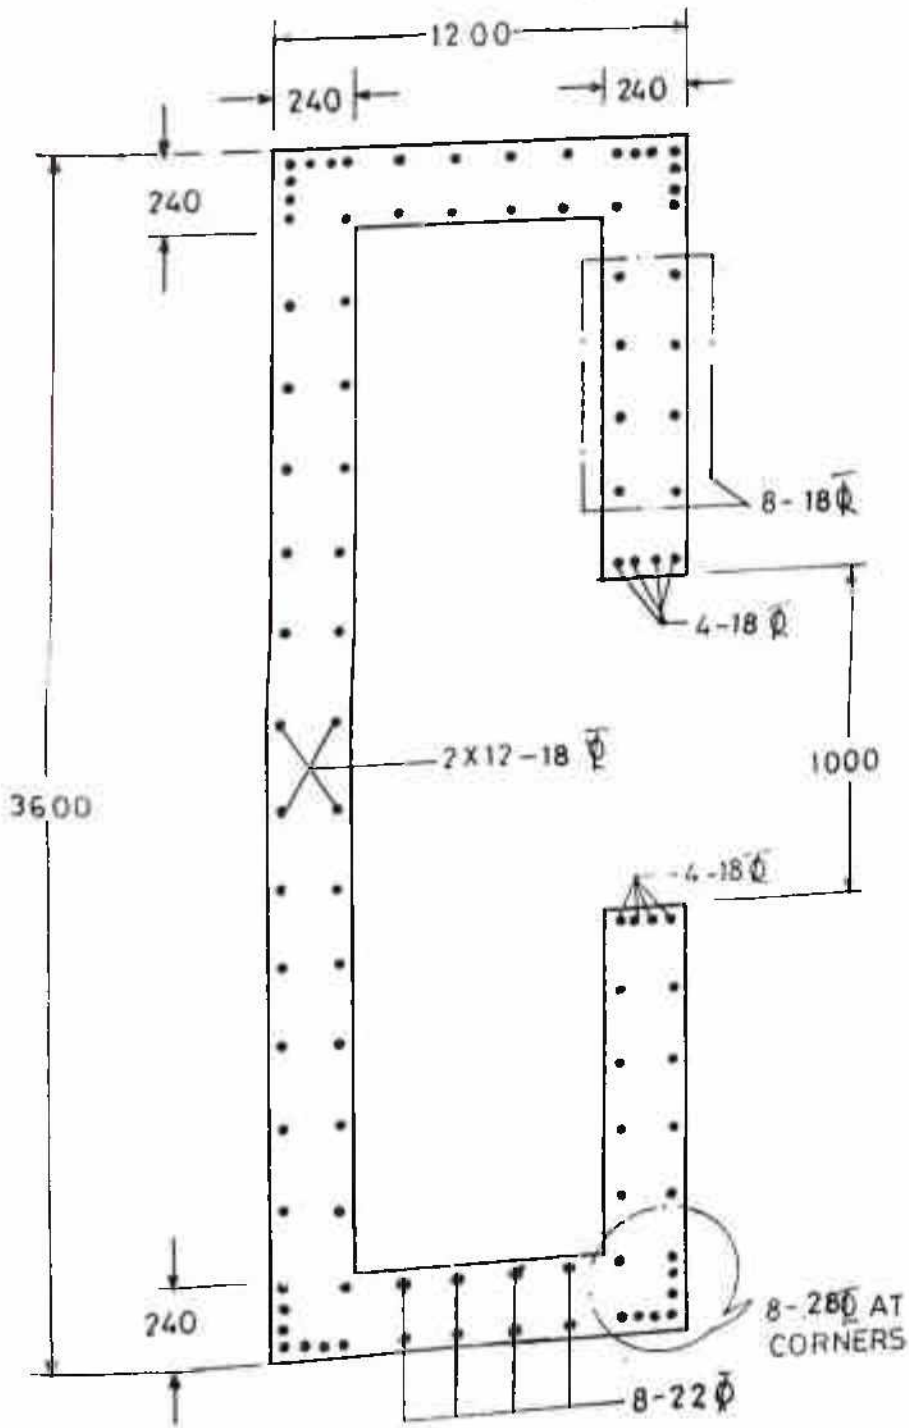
DESIGN EXAMPLE OF RECTANGULAR CEE COLUMN SECTION
